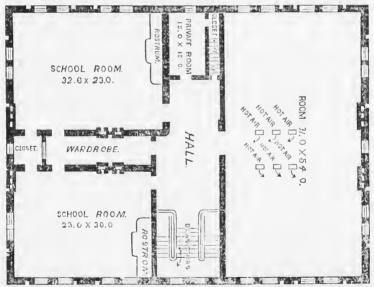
PLAN OF SECOND FLOCK, ADAPTED TO FIGS 202 AND 203.
